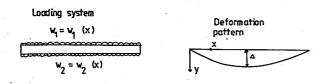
Loading system and Deformation pattern for load bearing wall
